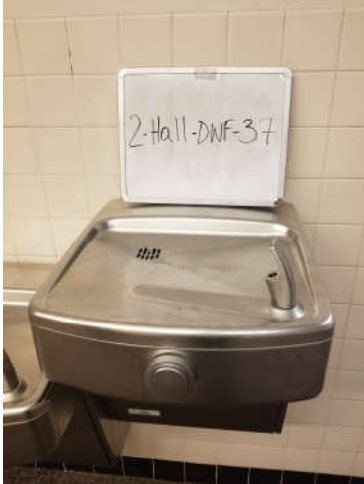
Drinking water faucet, located on the 2nd floor in hallway.
